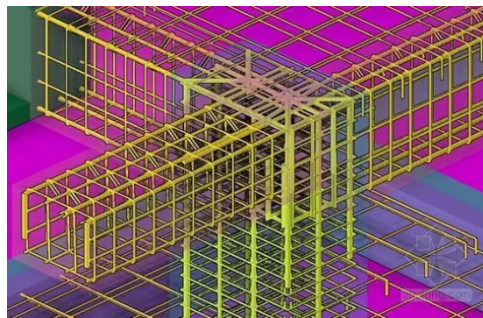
3D reinforcement model of prefabricated concrete structures
